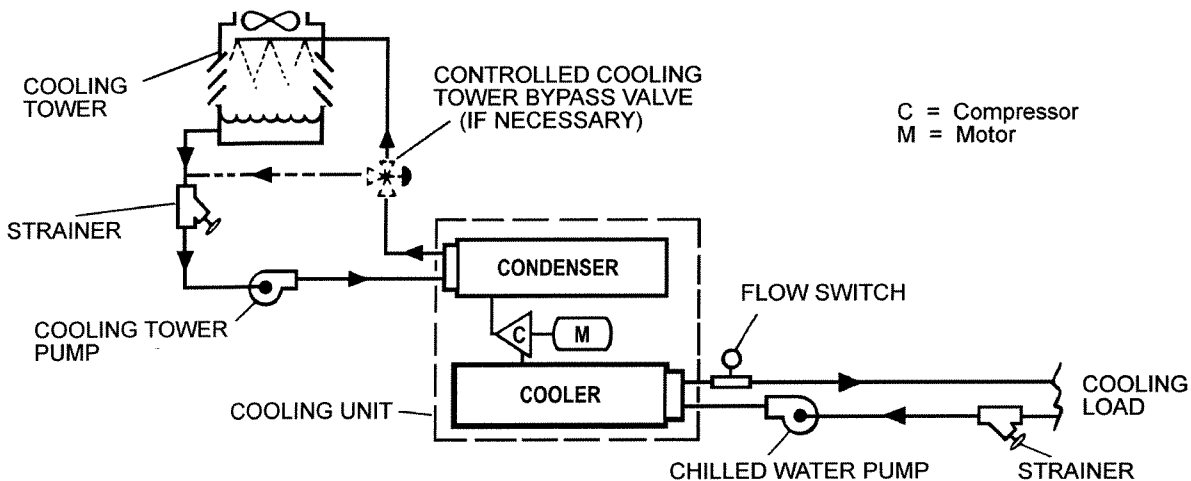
SCHEMATIC OF A TYPICAL PIPING ARRANGEMENT
